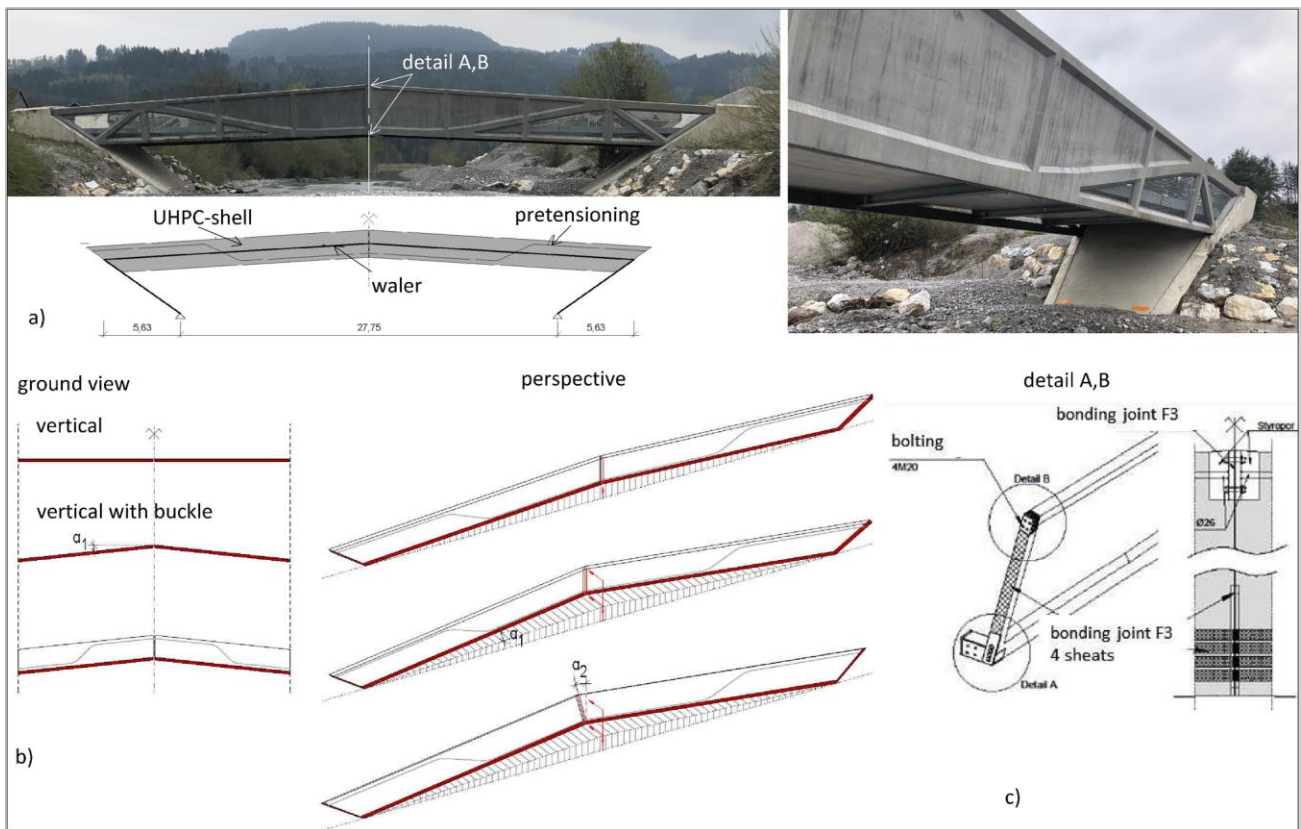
Paulifurt bridge in Austria [6] a) View frame
